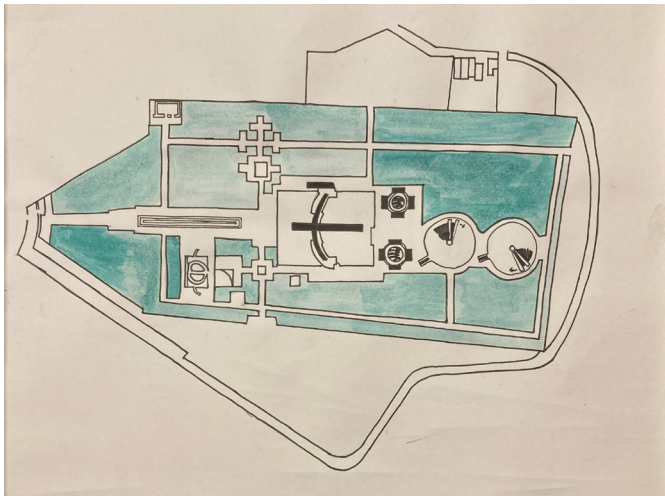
Personal Sketch of the Floor Plan of Jantar Mantar, New Delhi
